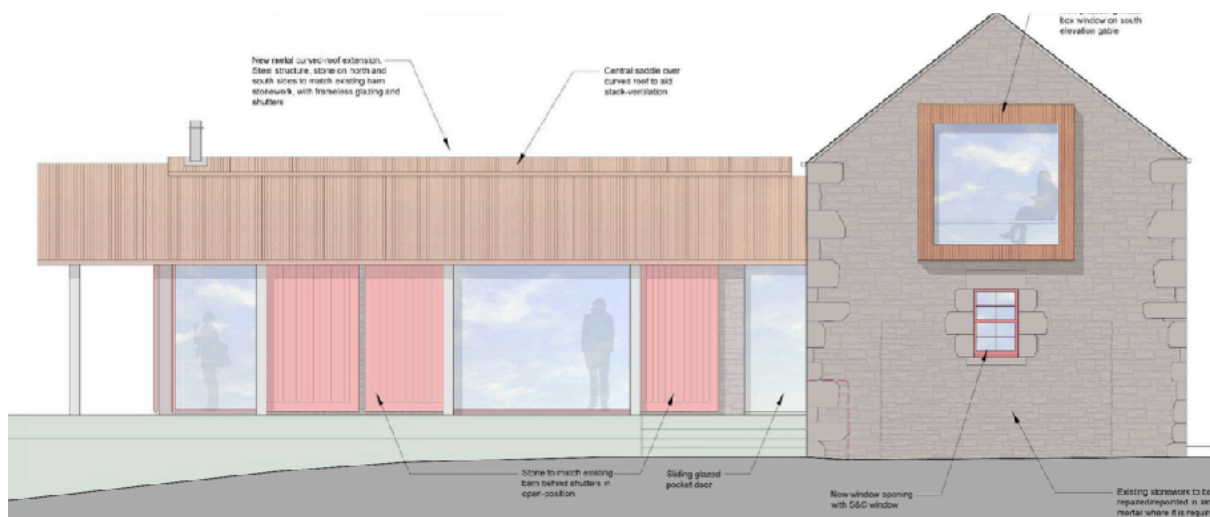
elevation drawing extract from proposed application 18/01490/FUL showing proposed red metal roofing and cladding.
